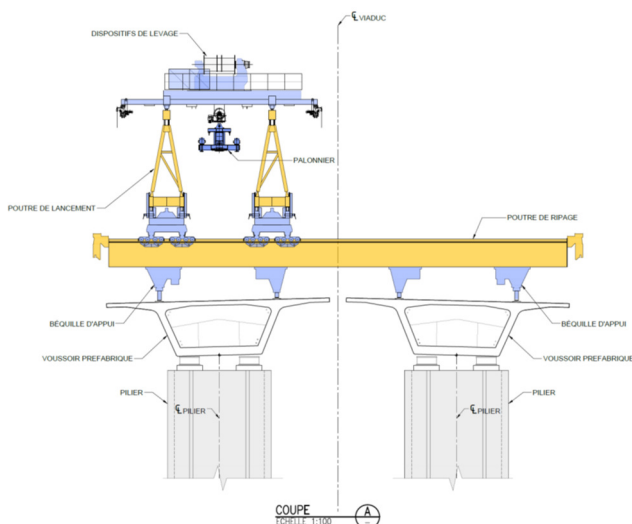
Frontal view of erection equipment used for typical viaducts / Vista frontale del carro varo utilizzato per i viadotti tipici.
